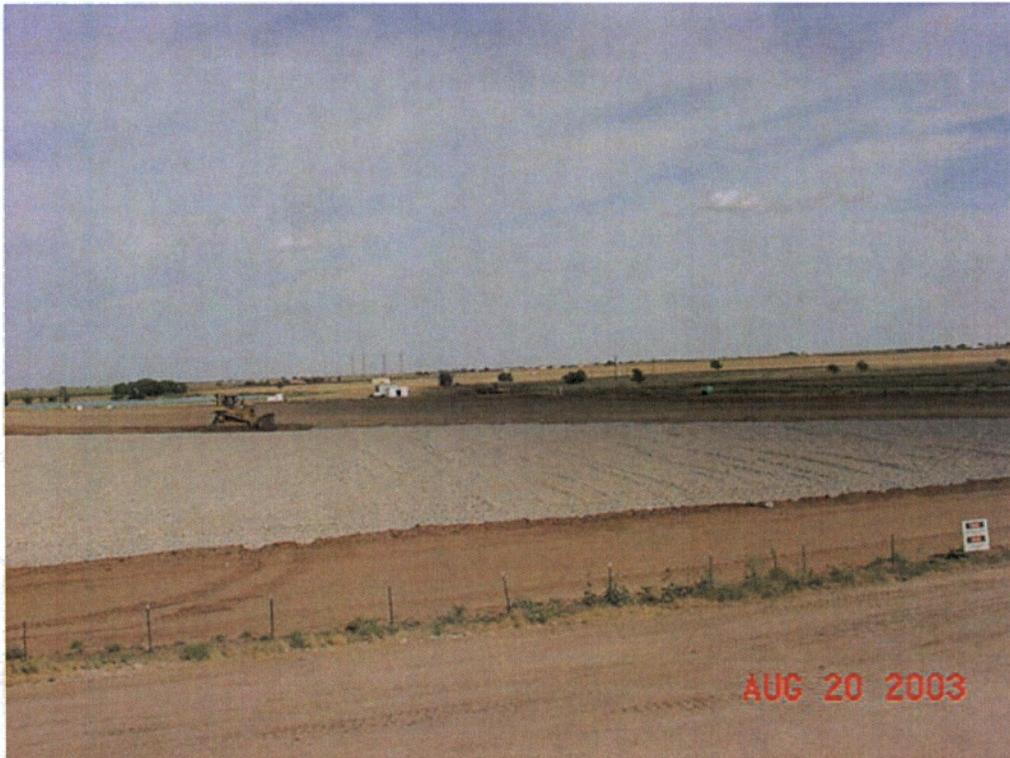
Area A—Biota Barrier Layer Construction, Southwest Corner
